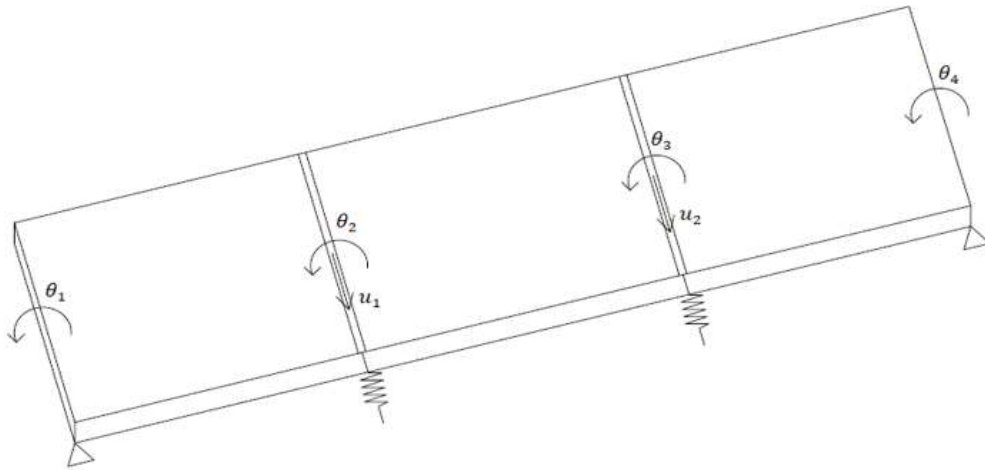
Plan View of 3-Span Bridge Deck Showing Degrees-of-Freedom
